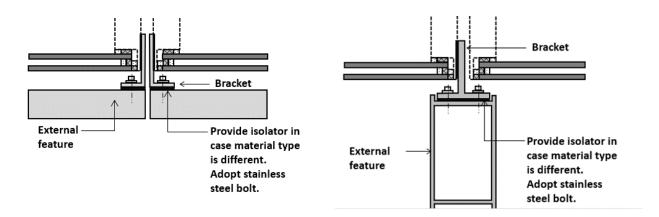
Example - plan drawing (detail) on left and right illustrating connection between curtain wall and metal external feature on the exposed face of the facade. Providing metals of similar metal properties or separator/isolator helps to mitigate risk of bi-metallic corrosion.
